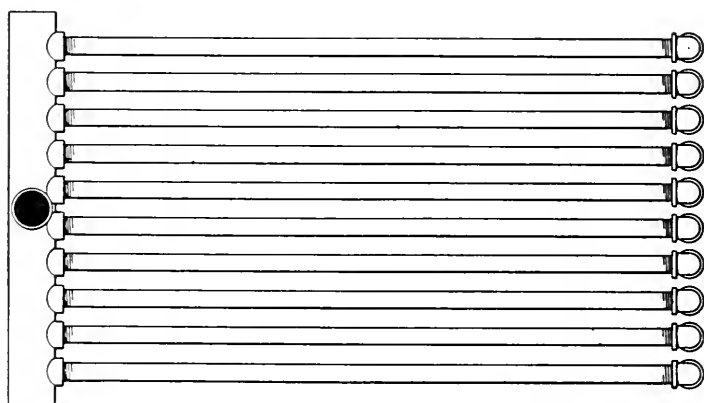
PLAN VIEW OF COIL WITH MANIFOLDS.
